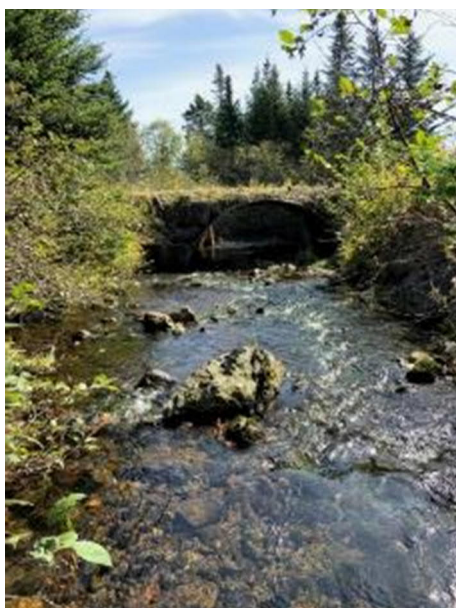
Large Culvert at the Outlet of Wetland 7 (19 July 2021)
